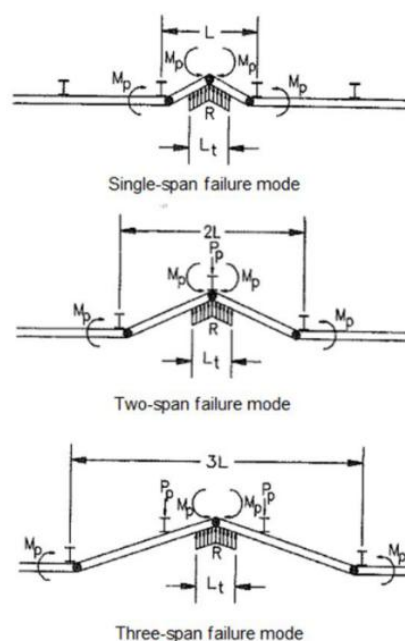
Possible failure modes for post and rail with failure of 1, 2 or 3 spans of posts (Source: Austroads AP-R445-13 Standardised Bridge Barrier Designs / AASHTO LRFD Bridge Design Specifications)
